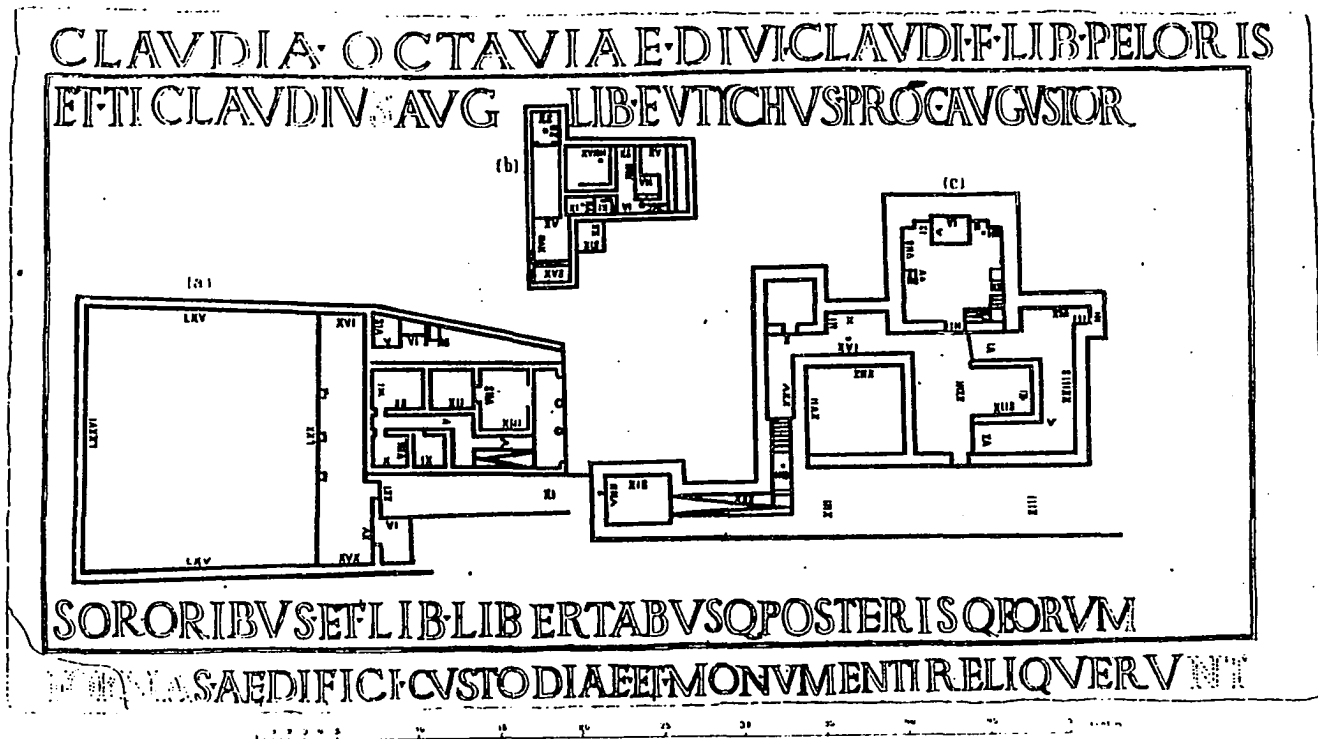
The Perugia Plan. In the plan on the left, the ground floor of the custodial building appears, with an enclosure wall around an open court, and a covered portico adjoining the building (scale about 1: 140). The center plan shows the upper floor of this same structure; the line of rooms on the left were ranged over the portico just mentioned (scale about 1: 230). The plan on the right depicts the sepulchral structures overseen by the those stationed in the custodial building (scale about 1: 84). (Jordan (1874))
